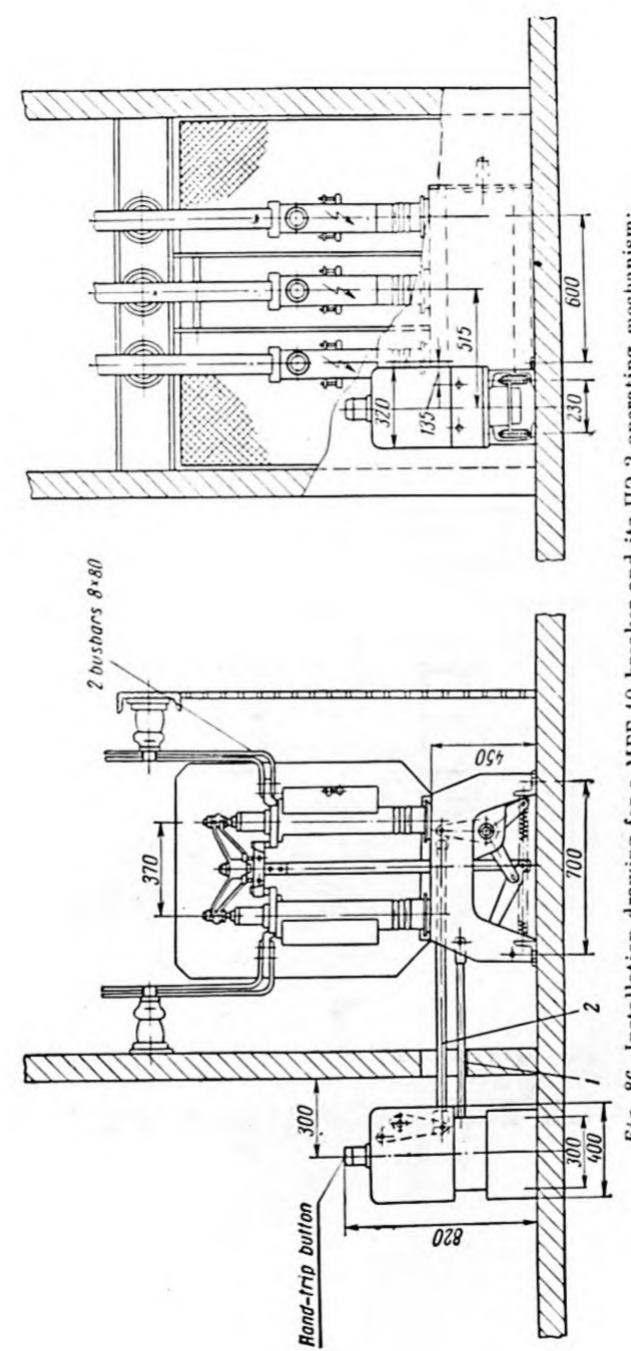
Installation drawing for a MFF-10 breaker and its II3-2 operating mechanism: I-strut; 2-pipe tie rod
